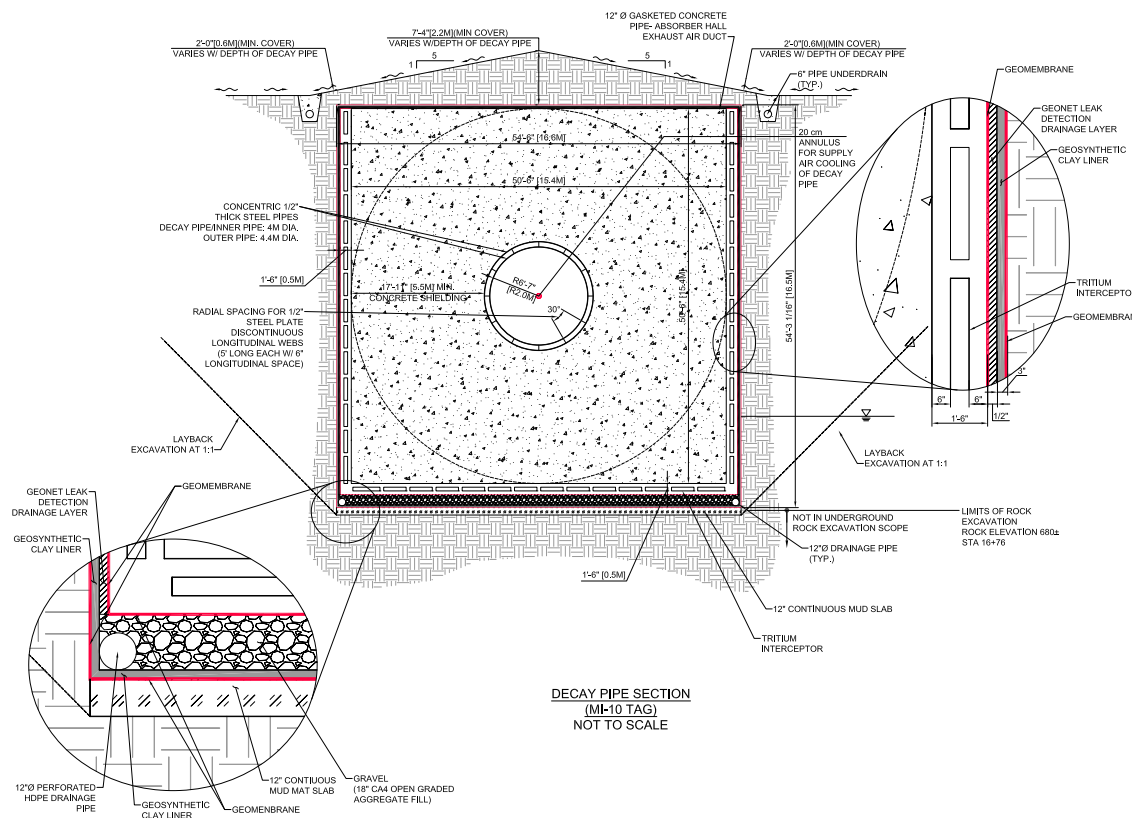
Typical cross section of concentric decay pipe and shielding concrete.
